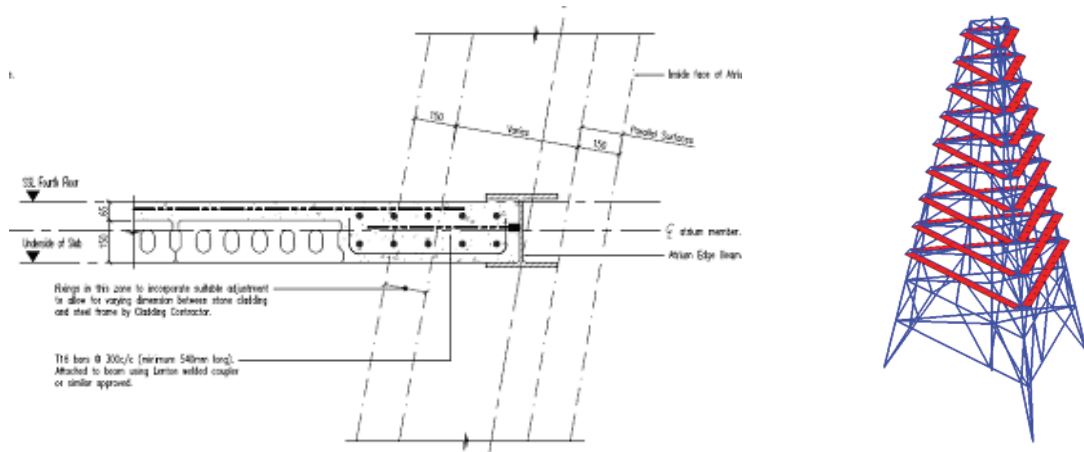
(a) Edge beam to floor detail (b) Slab panels providing lateral restraint
